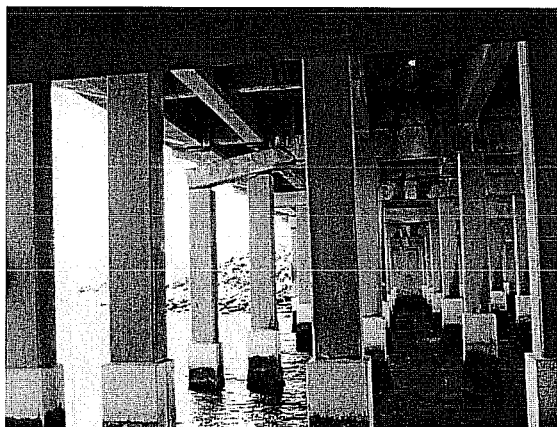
Failure of pier pile cap at Wantagh Parkway over Goose Creek
